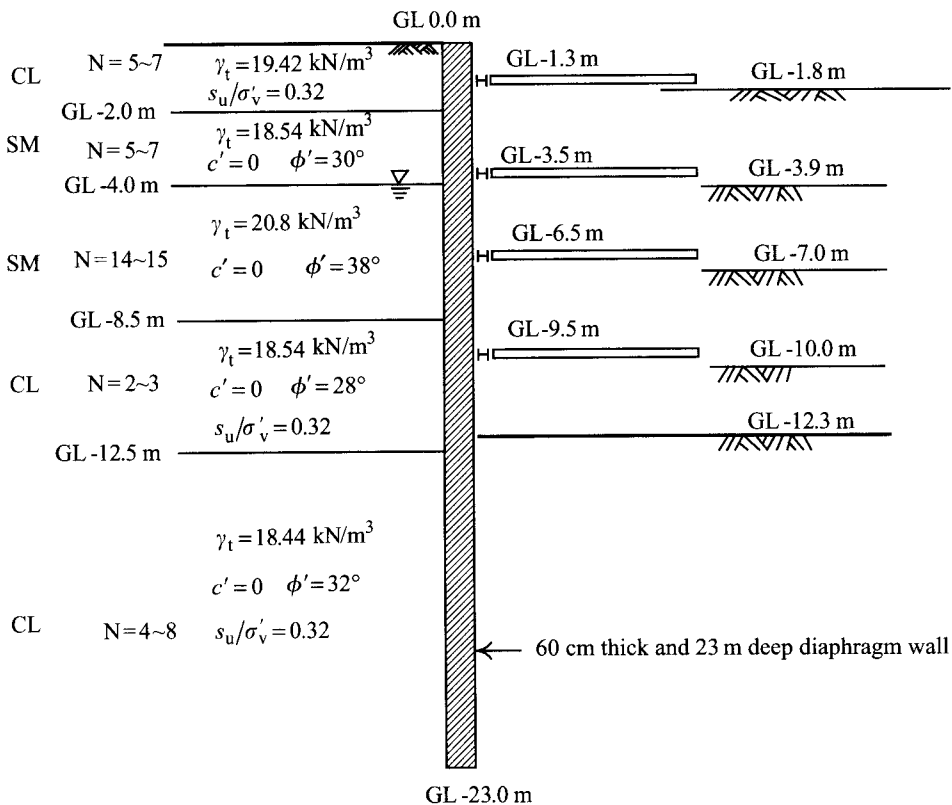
Soil and excavation profile of Building P in Taipei.
